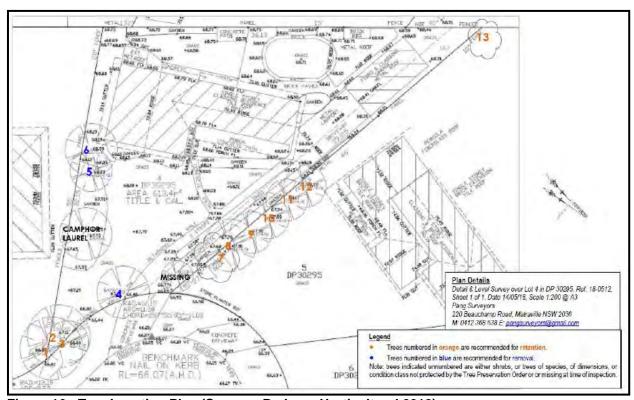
Tree Location Plan (Source: Redgum Horticultural 2018)
